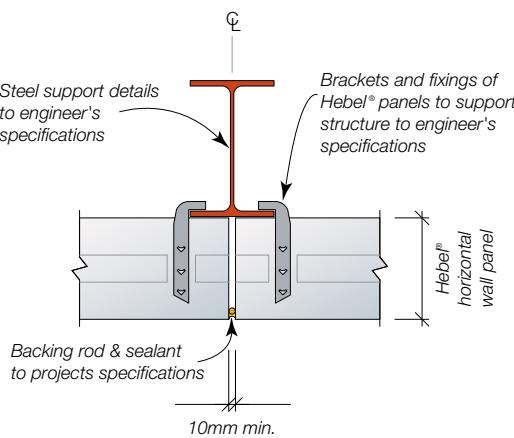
Horizontal wall panel & steel base support detail (elevation).
